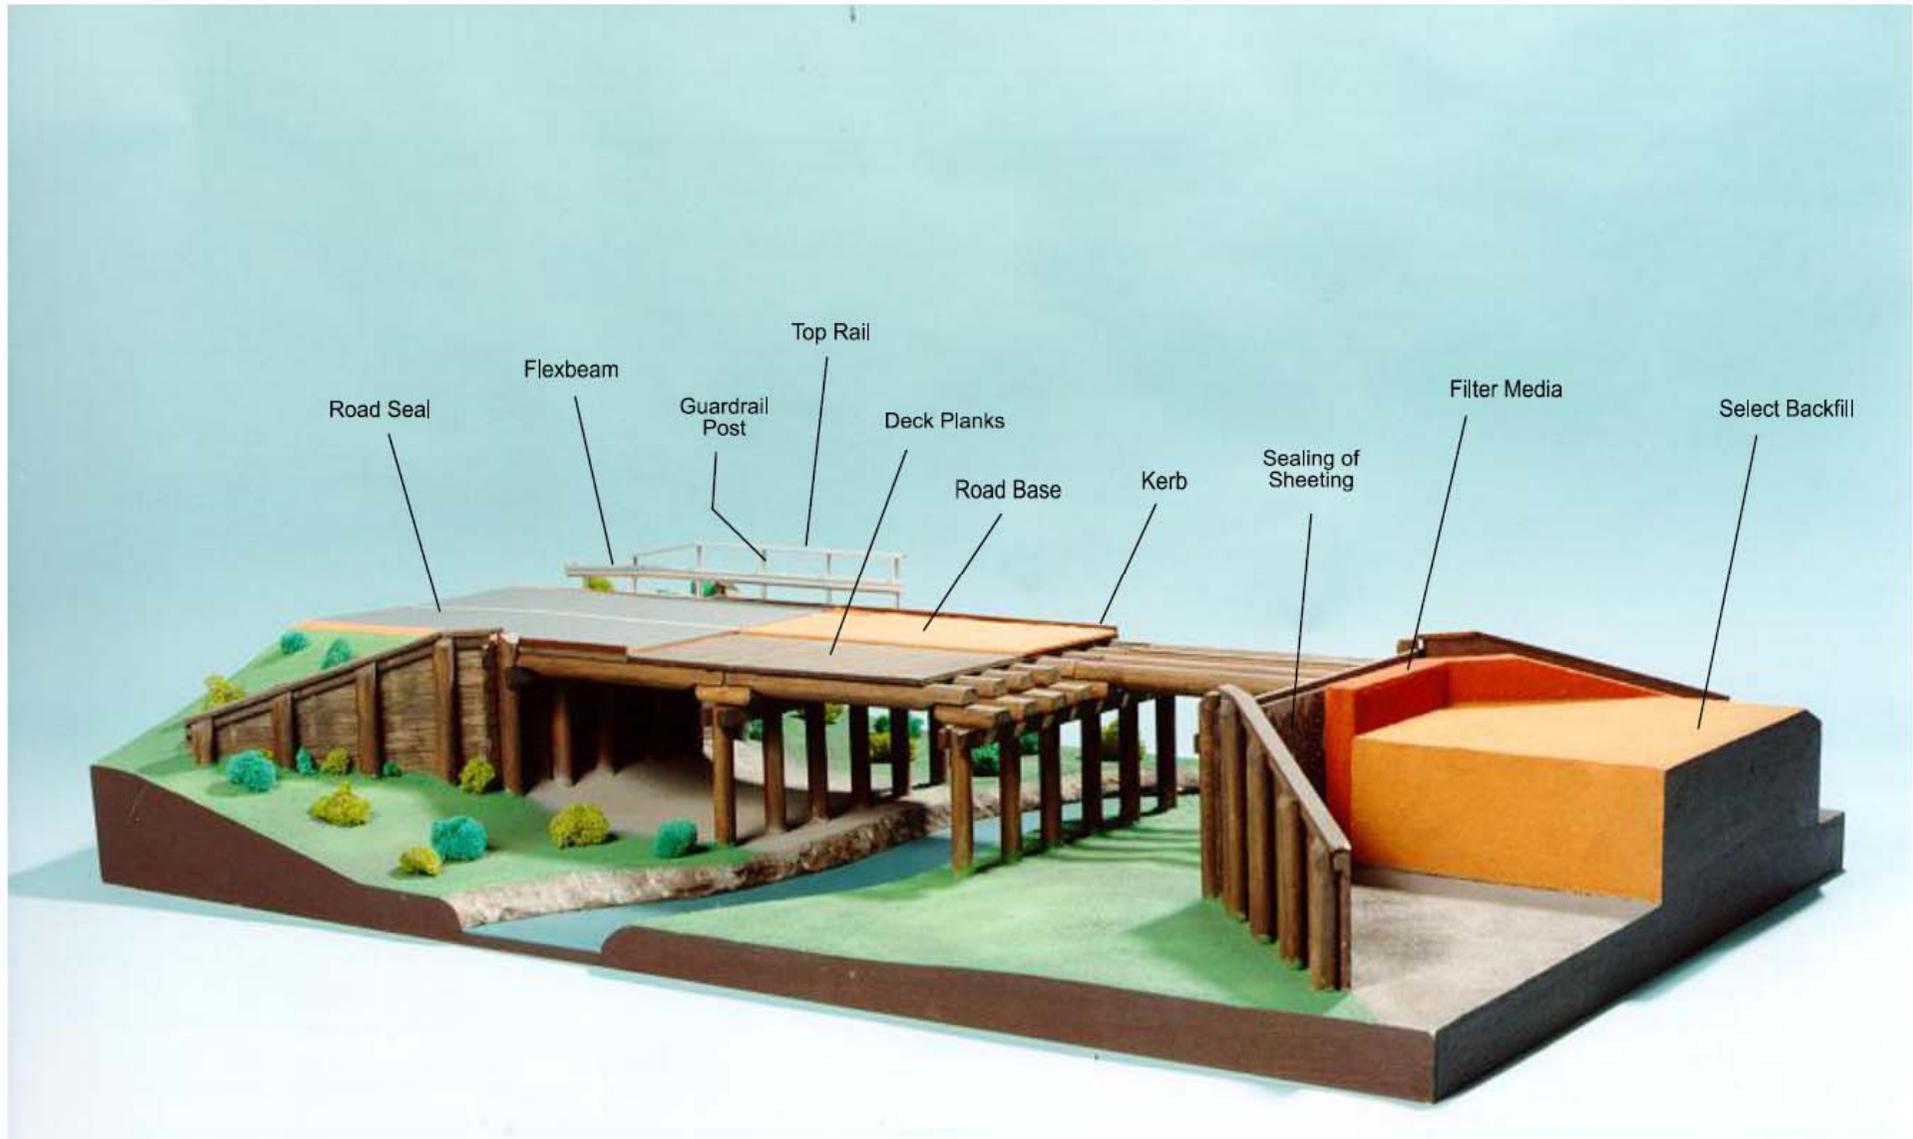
TYPICAL TIMBER BRIDGE STRUCTURE
